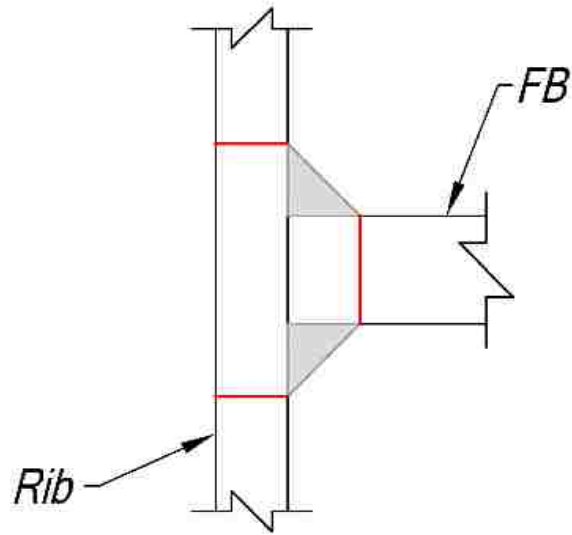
Potential modes of toe cracking shown on a cross section of a typical rib-to-floor beam connection
